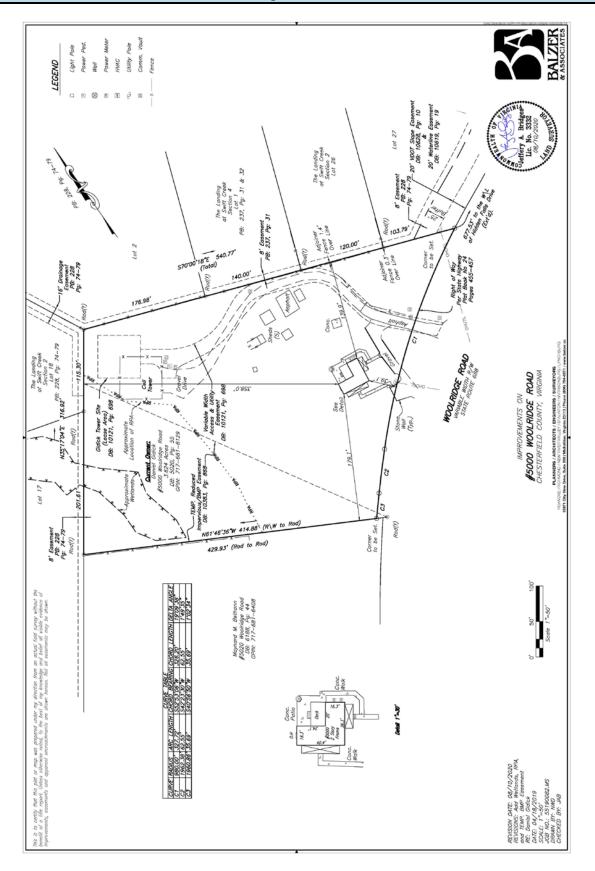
EXHIBIT B: BOUNDARY SURVEY AFTER ROAD WIDENING
